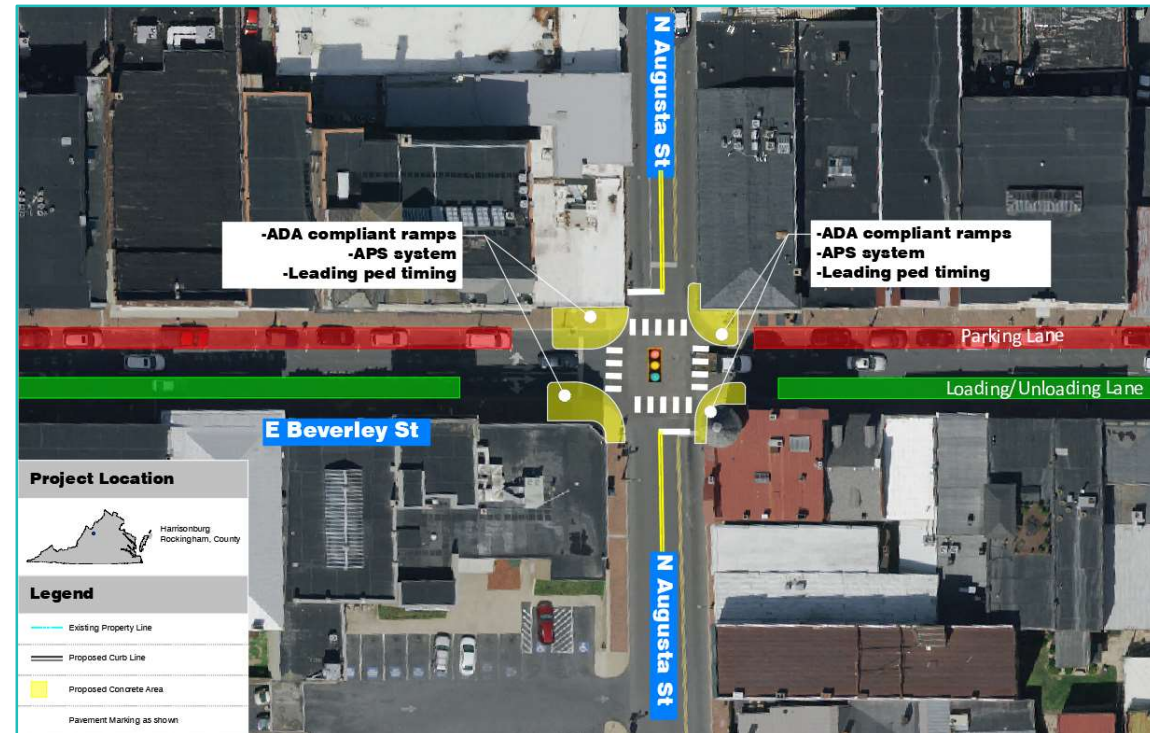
Alternative 1 Concept Sketch – West Beverly Street at Augusta Street
